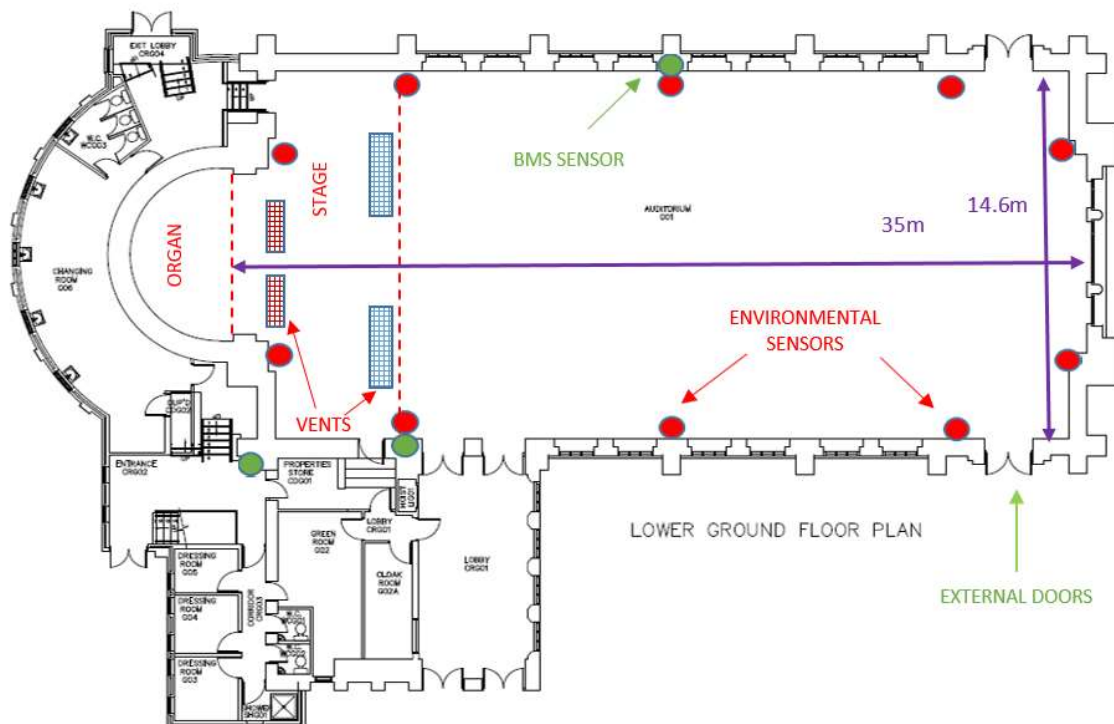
Building floorplan showing basic dimensions of the auditorium, location of external doors within it, and location of supply (blue) and extract (red) vents on the stage for the cooling system. The location of BMS sensors (in green) and additional environmental sensors (red circles)
